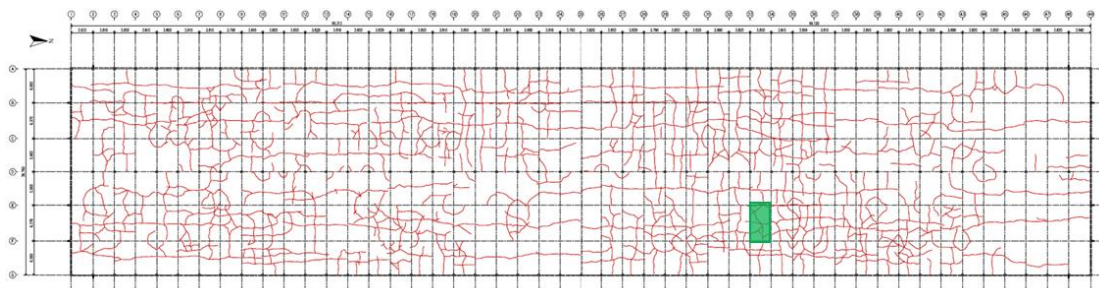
1<sup>st</sup> floor plan illustrates crack lines (red) and a testing area (green).
